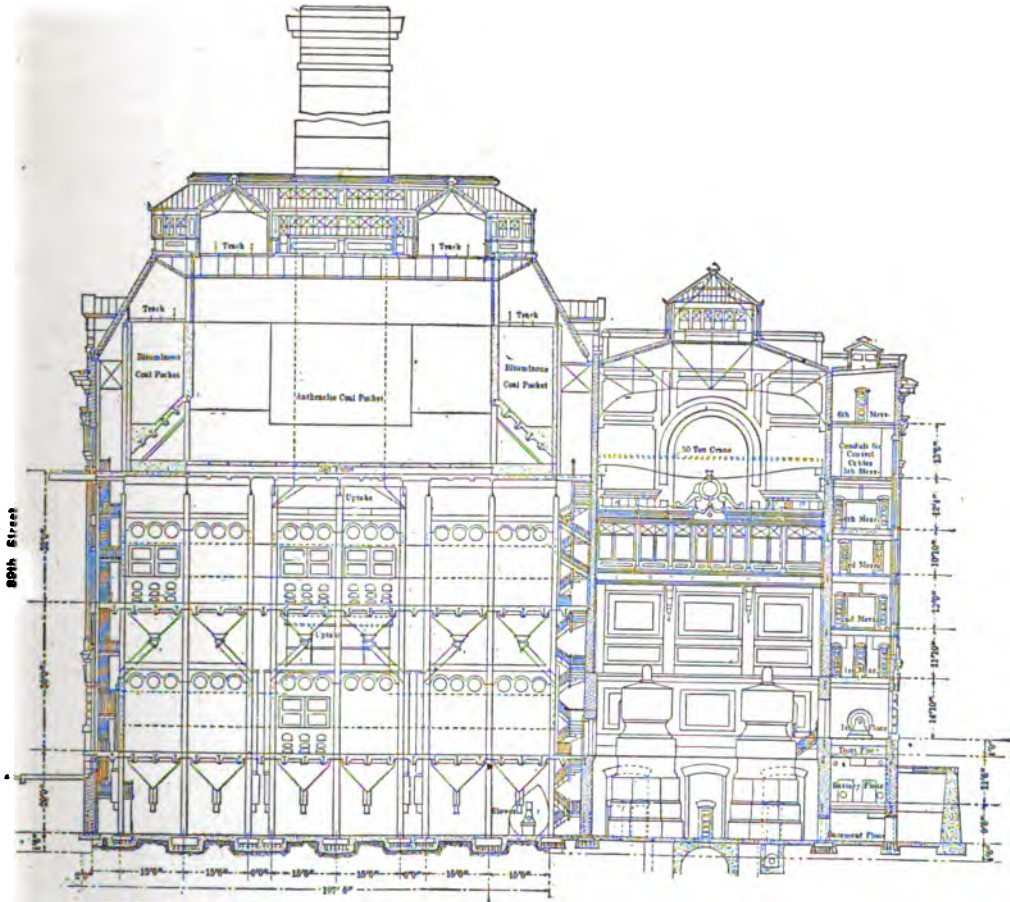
Structure of Waterside Plant No. 2, New York (*Electrical World*).
